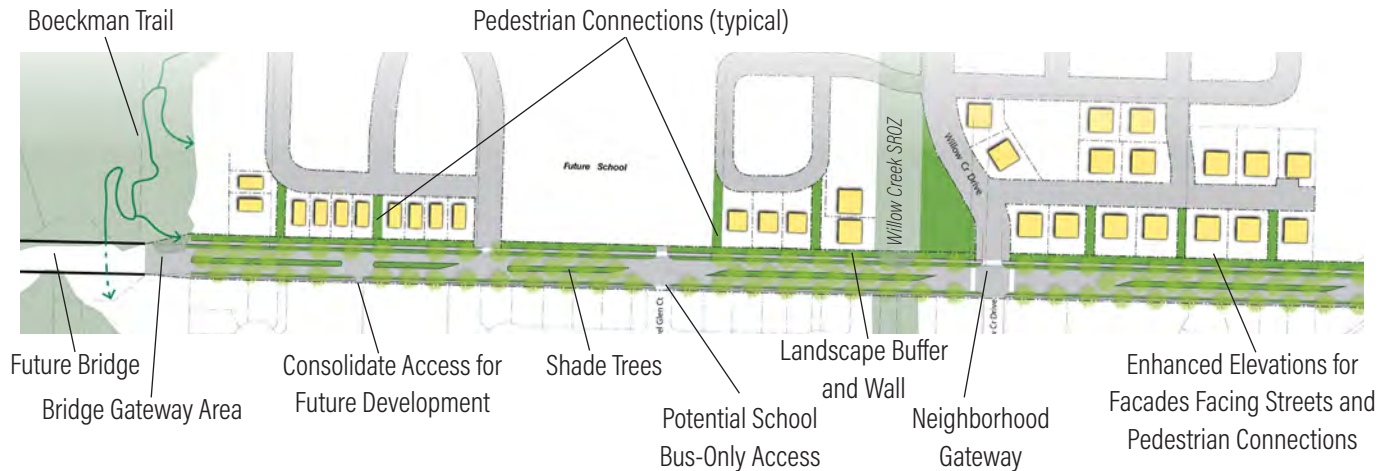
Boeckman Road and Stafford Road Frontage Improvements
